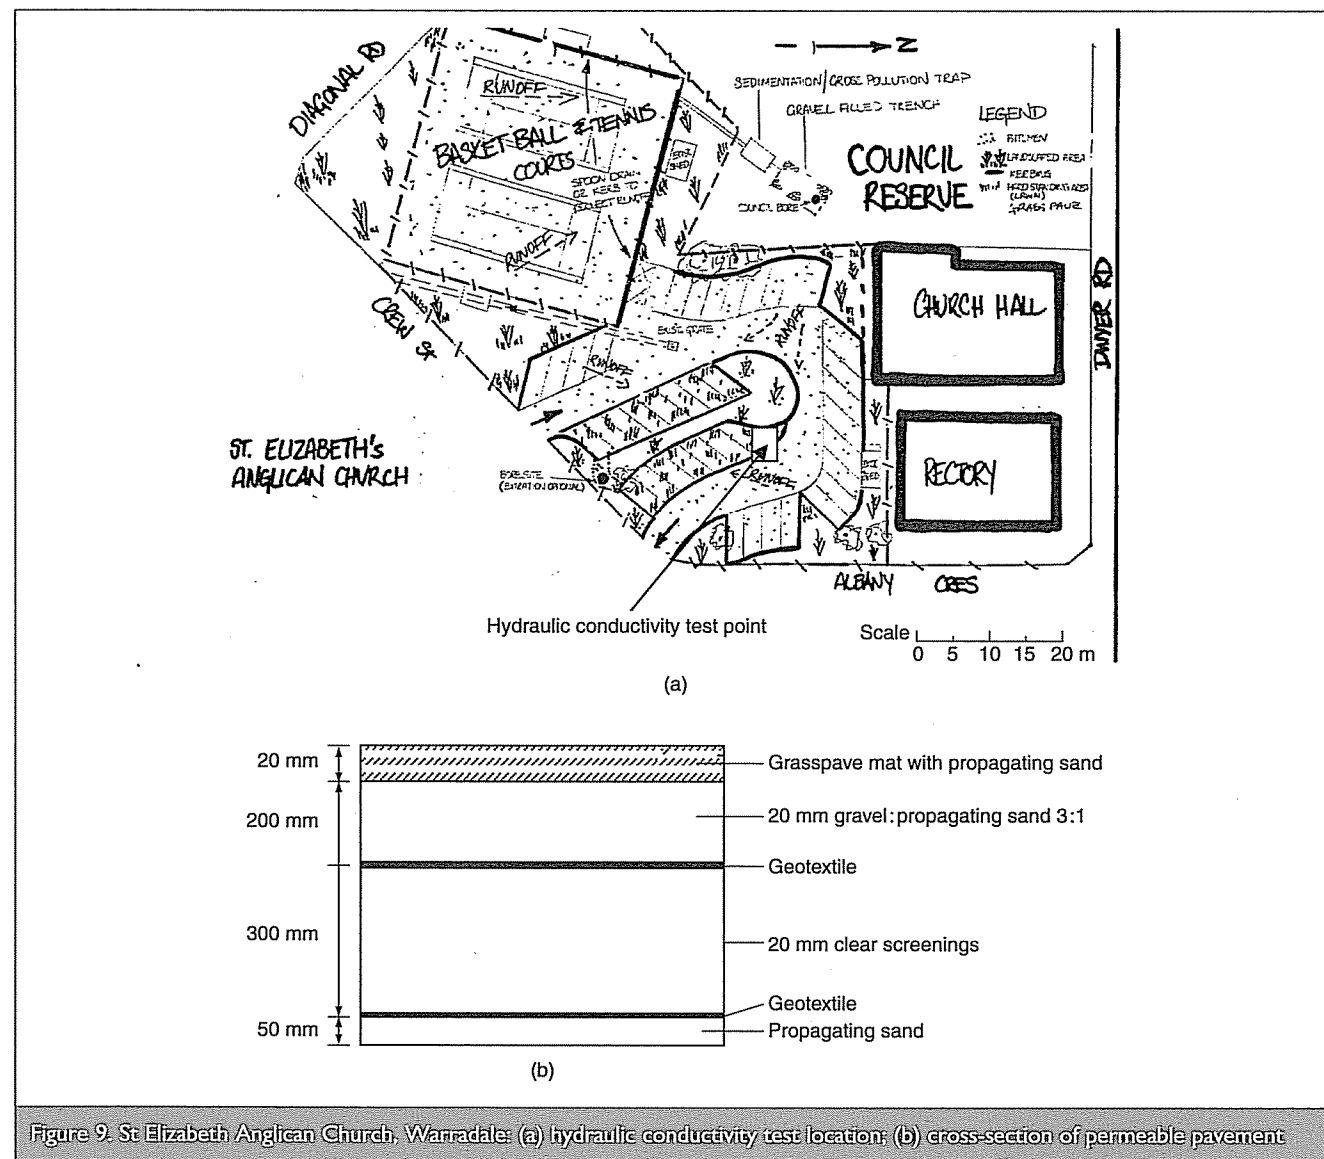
St Elizabeth Anglican Church, Warradale: (a) hydraulic conductivity test location; (b) cross-section of permeable pavement
